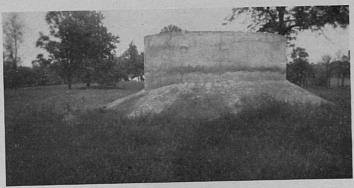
Concrete gravity tank on a hill near and slightly above the buildings to be supplied. It should be covered to keep out dirt and birds.
